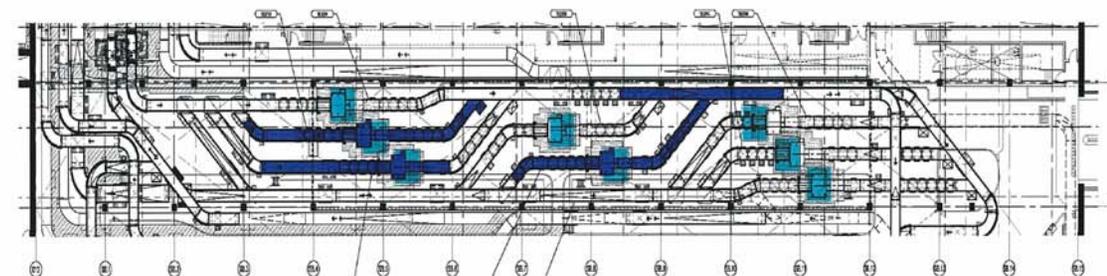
0 - Mezzanine Level Design - Option #1 with BHS layout
